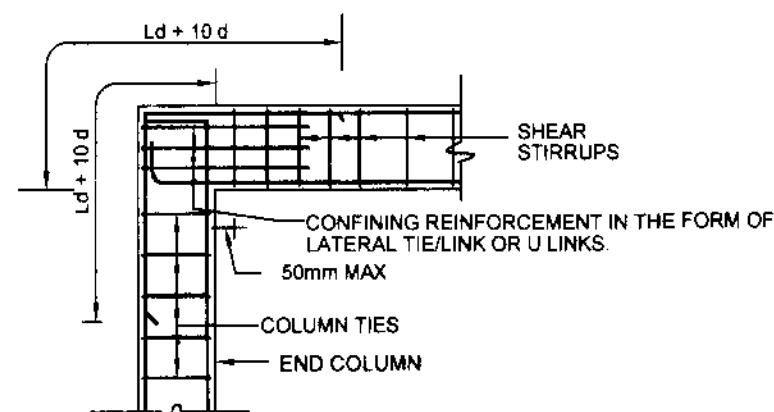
(a) :- FIXED END JOINT IN A COLUMN
